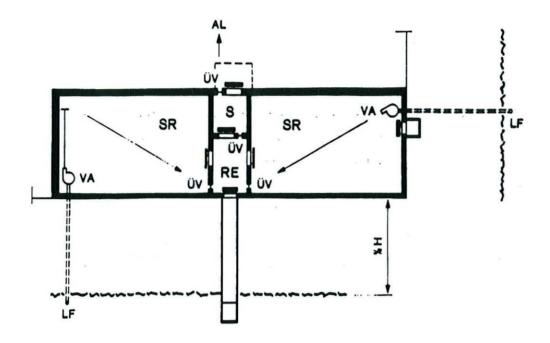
The arrangement of the ventilating equipment in a double celled shelter group (51 to 100 places).
